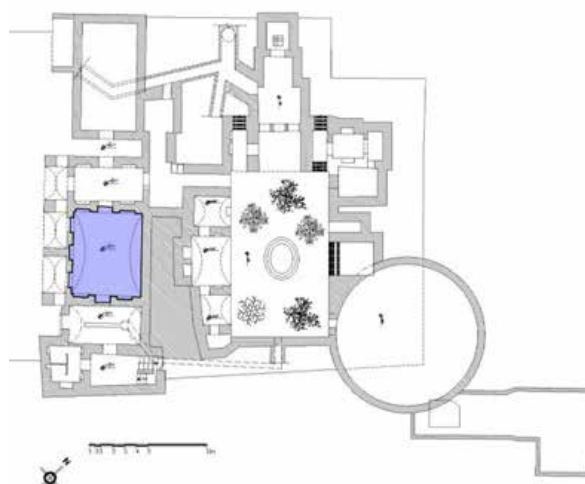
Underground floor plan of Oloomi’s house and Dodari (2- door- room). Source: Cultural heritage institute of Yazd.
